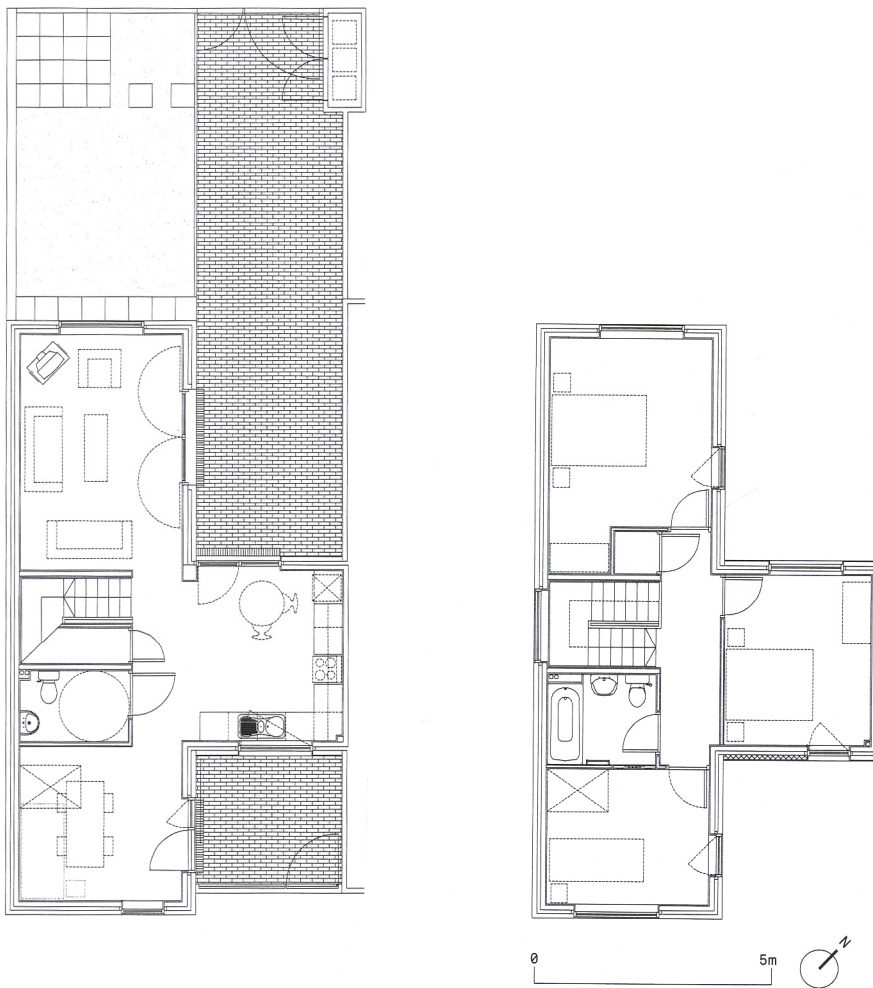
Ground and first floor plans of the 3 bed house type
